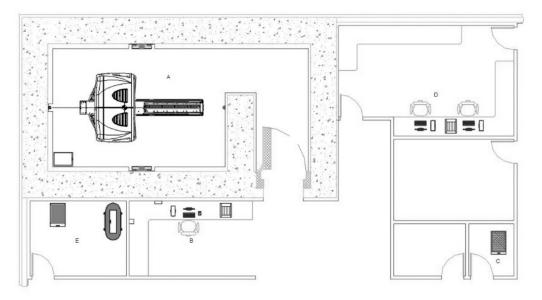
Typical Radixact System Floor Plan with Maze Walkway
